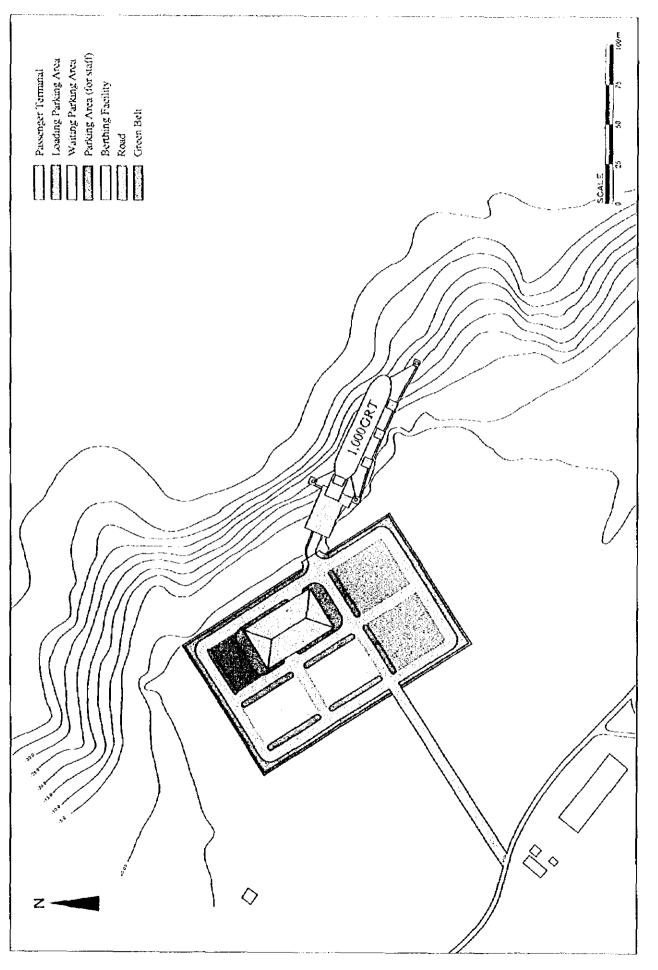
Layout Plan of Babang Ferry Terminal
